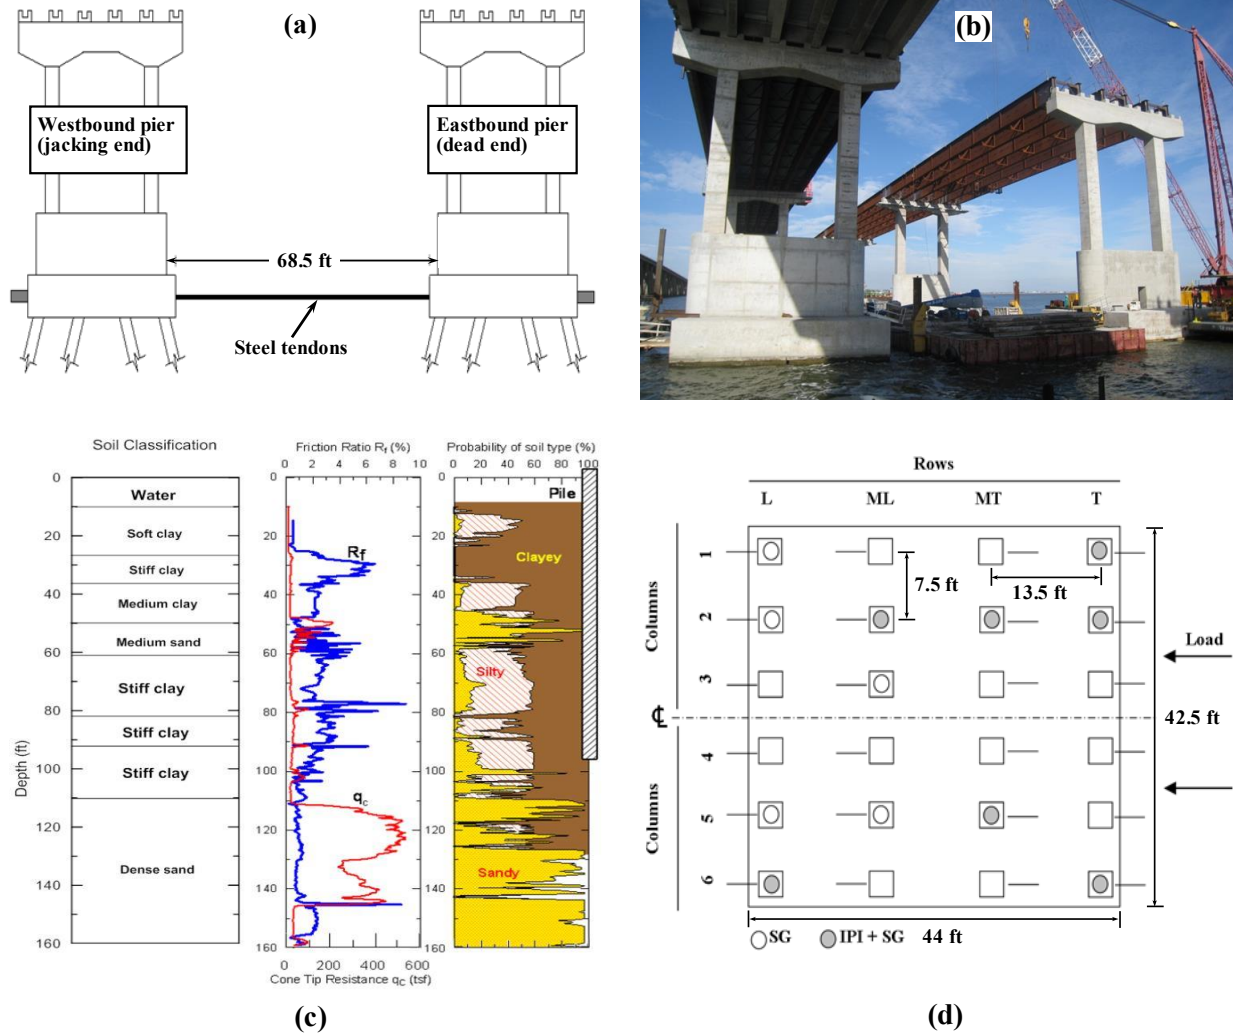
Lateral load test of M19 pier foundation (a), test site (b), soil profile and CPT sounding (c), and pile cap dimensions and piles' numbering (d)
